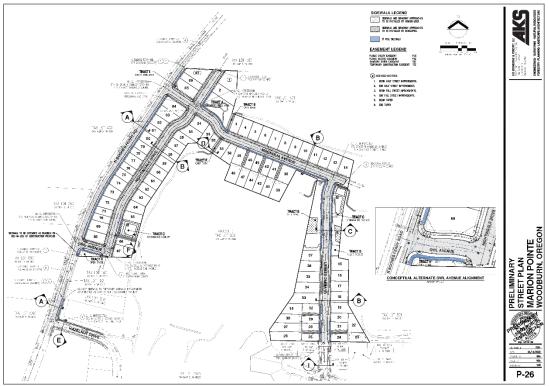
Site Plan Sheet P-26 Sidewalks (blue: min 8 ft wide); see Attachment 103 for full size
